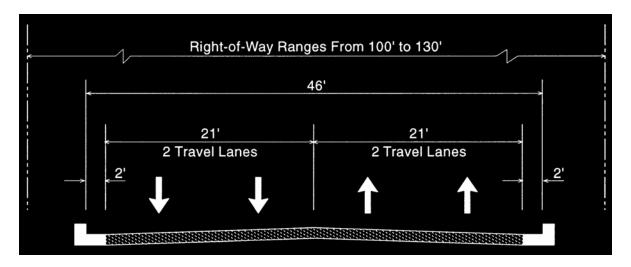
Existing Typical Riverside Avenue Cross-Section
